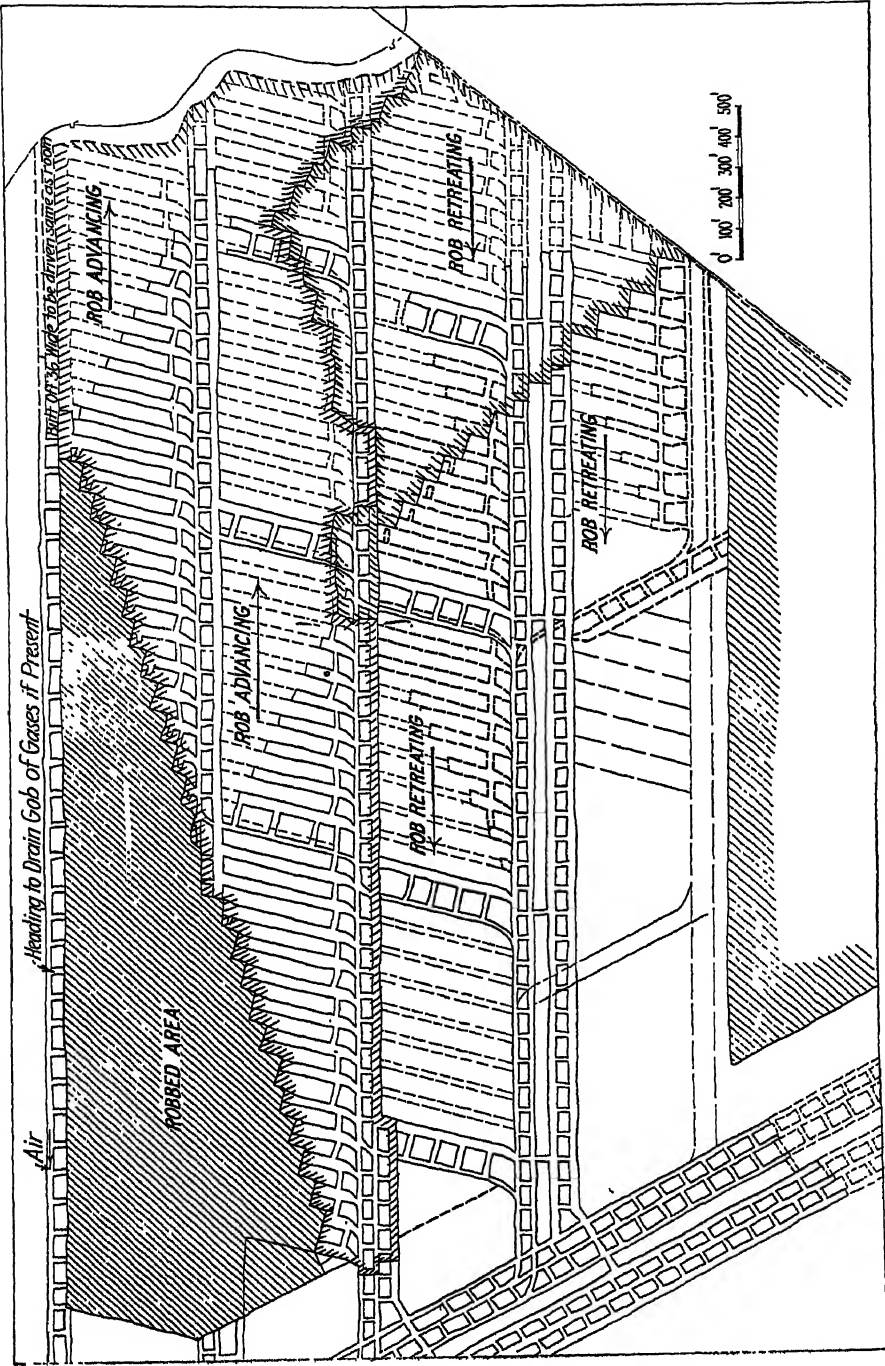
GENERAL PLAN OF OPERATION, MINE NO. 6, U. S. COAL AND COKE CO.
